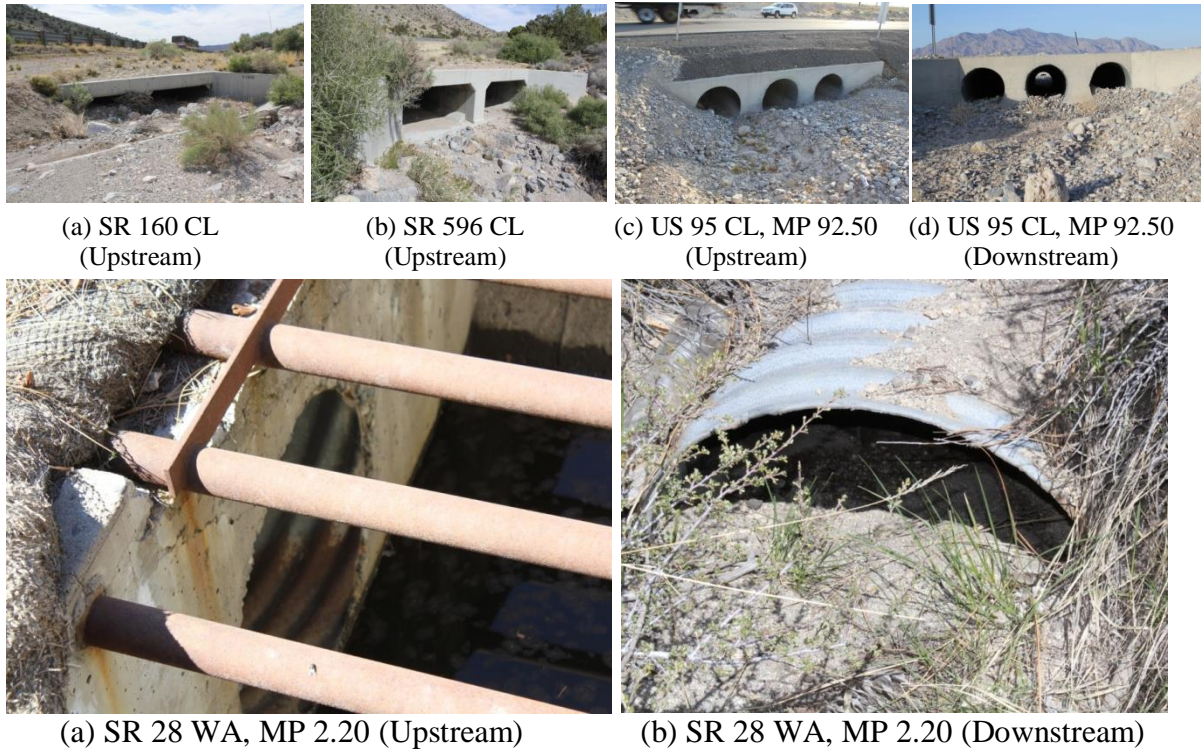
Culvert cleaning performed by SF and MBC private contractors.
